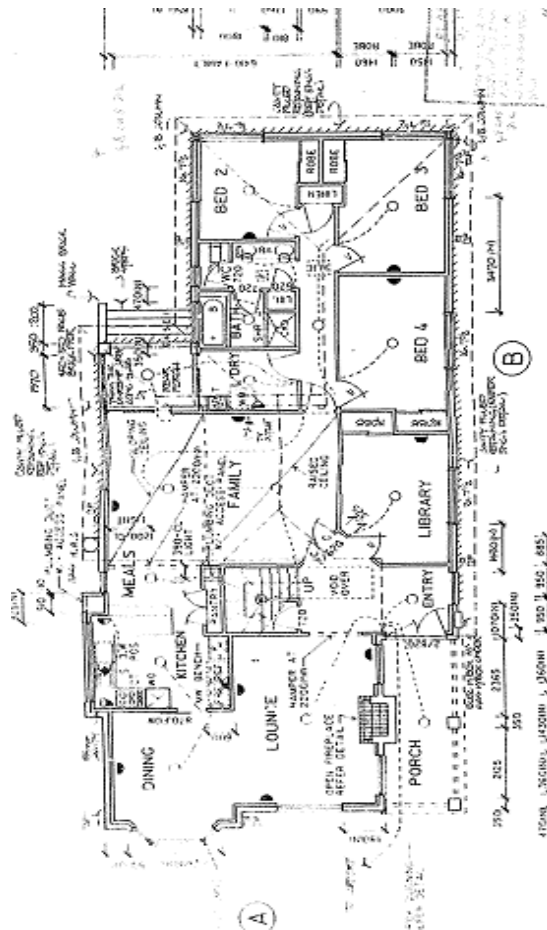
Ground Floor Plan of 8A Cowrie Crescent
